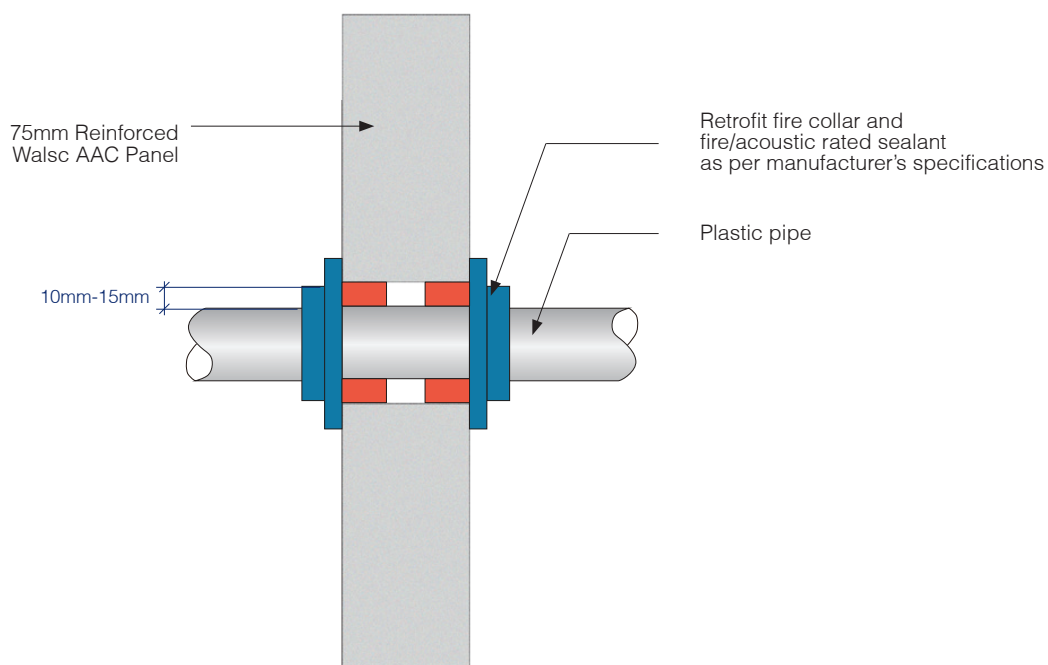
Plastic Pipe Penetration with Retrofit Fire Collar Detail
